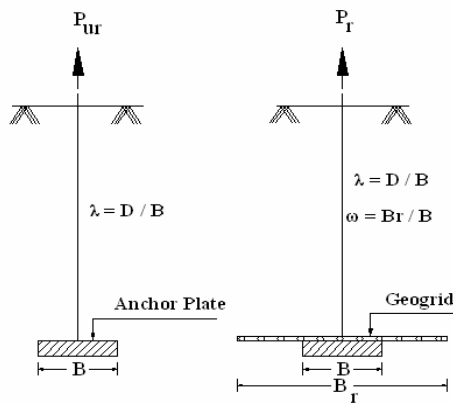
Arrangement of Anchors in Reinforced Anchor System
